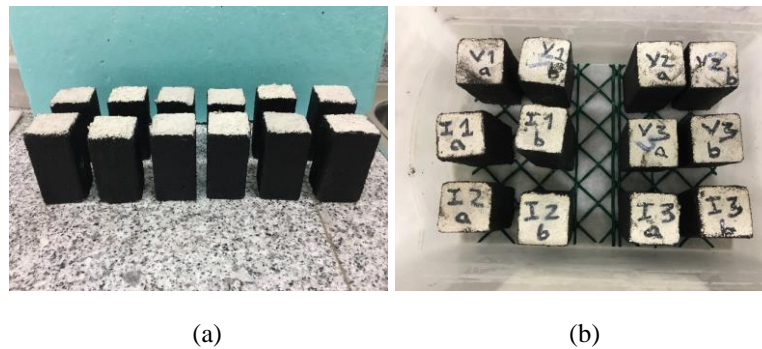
Capillarity test: (a) sealed samples and (b) samples during the test
